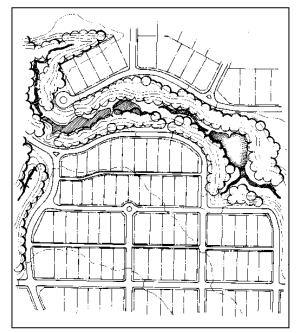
Street layout exception due to natural, topographical, or environmental features causing interruptions in the street network. The exception to the street standard still maintains the street connections and maximum block limits.
